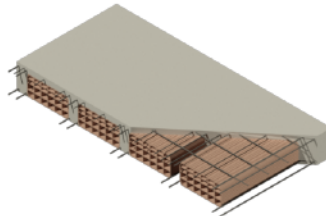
Reinforced Concrete floor deck made up of joists with upper slab and interlaid tile blocks.
